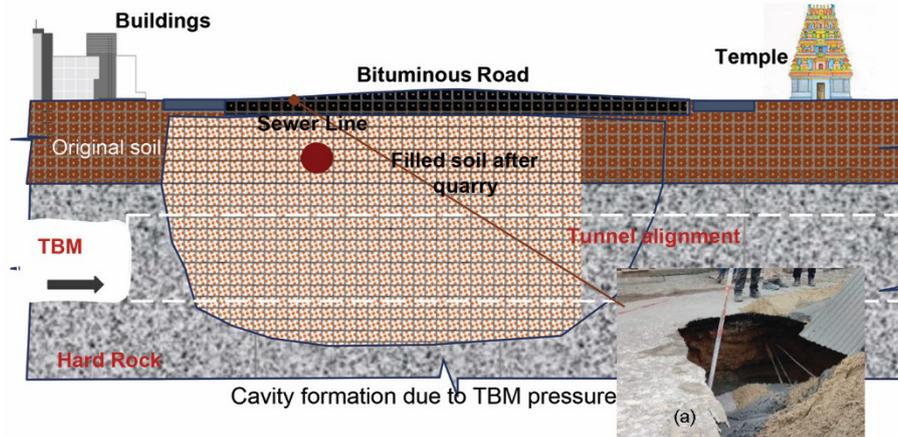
Blow-out cavity formation due to underground tunnelling work in a city.
